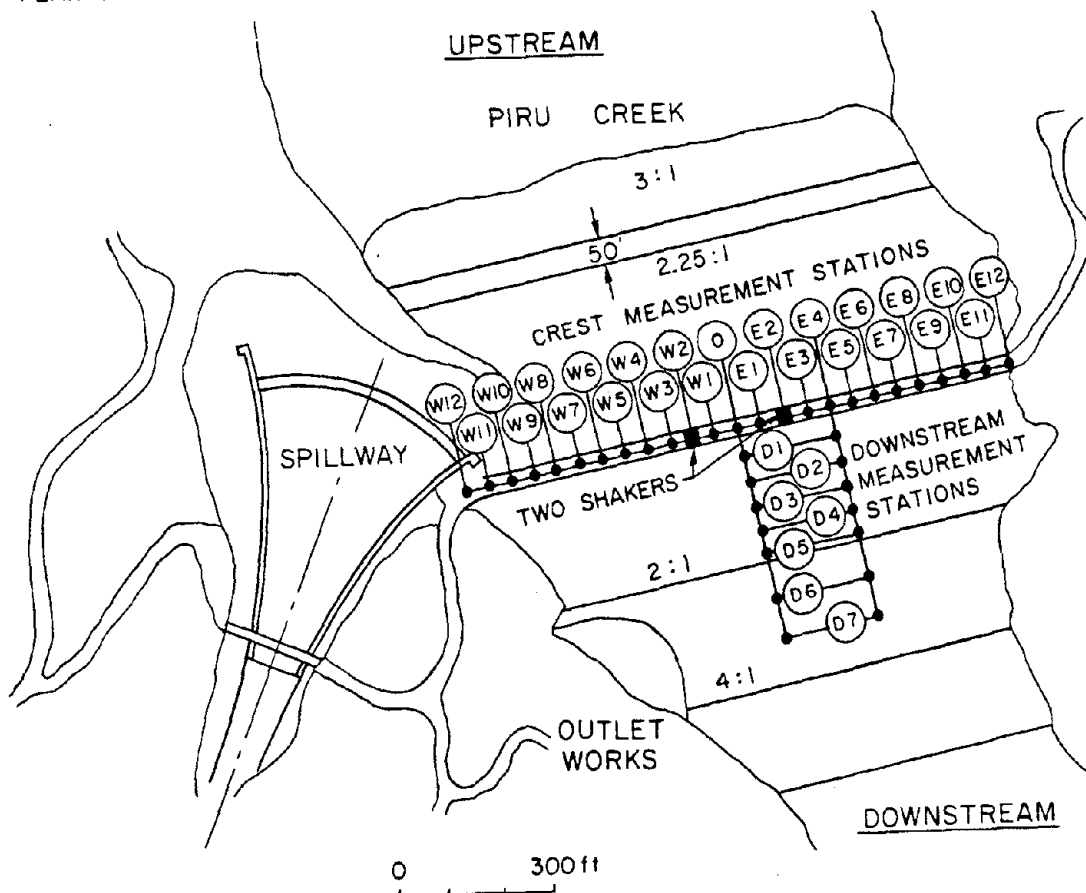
a Cross-section, plan view showing the measurement stations of the full-scale dynamic tests on Santa Felicia Earth Dam.
